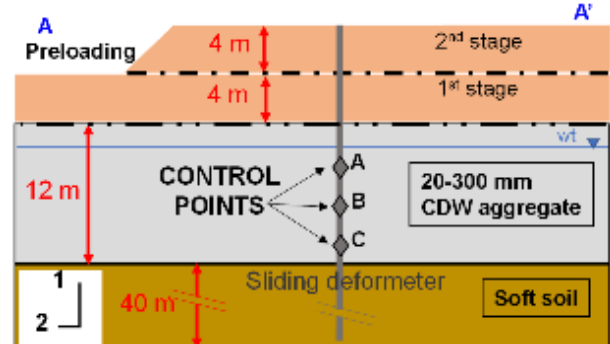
Instrumentation plan cross-section, Tarragó et al. (2023).
